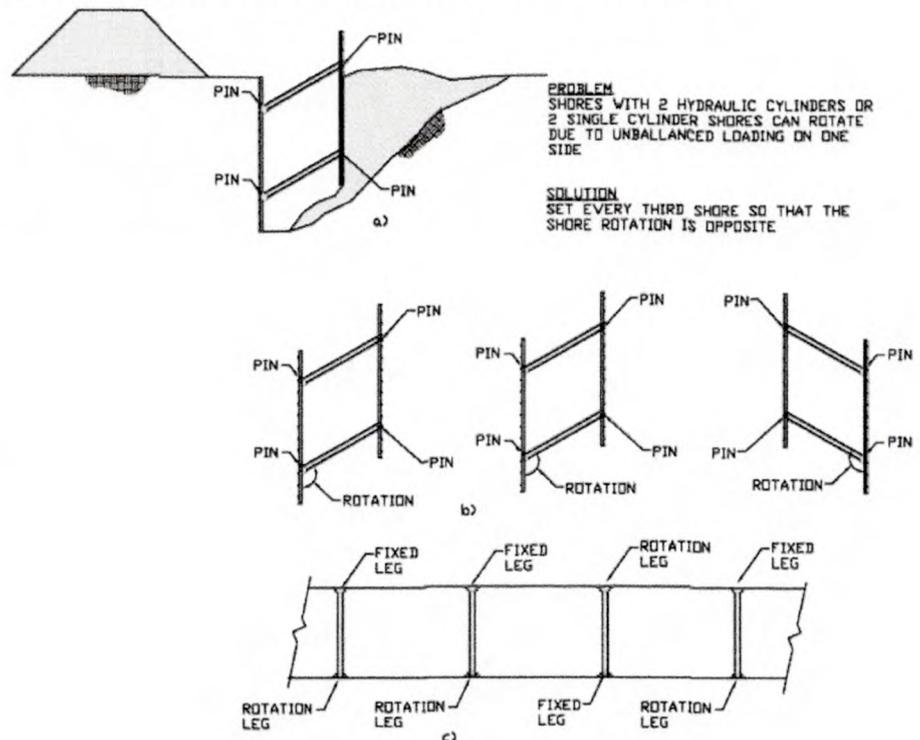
a) Trench jack fold up failure, b) leg rotation, c) jack rotation to prevent fold up failure
